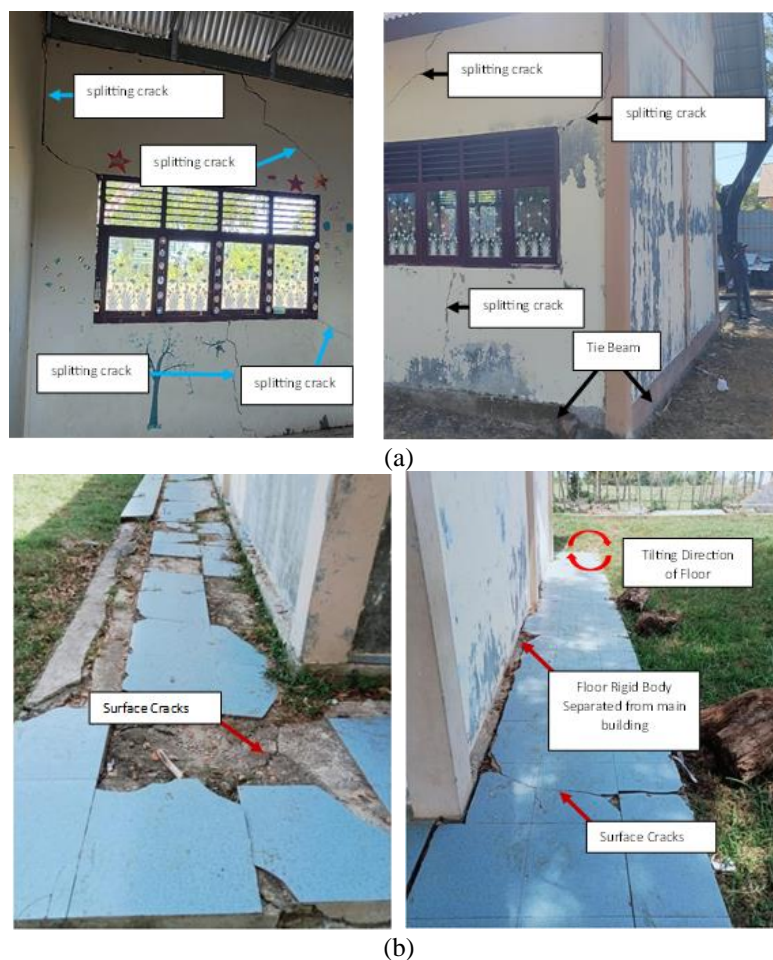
Cracks patterns on buildings (a) Typical cracks on wall section (b) Cracking and tilting on hallway corridor
